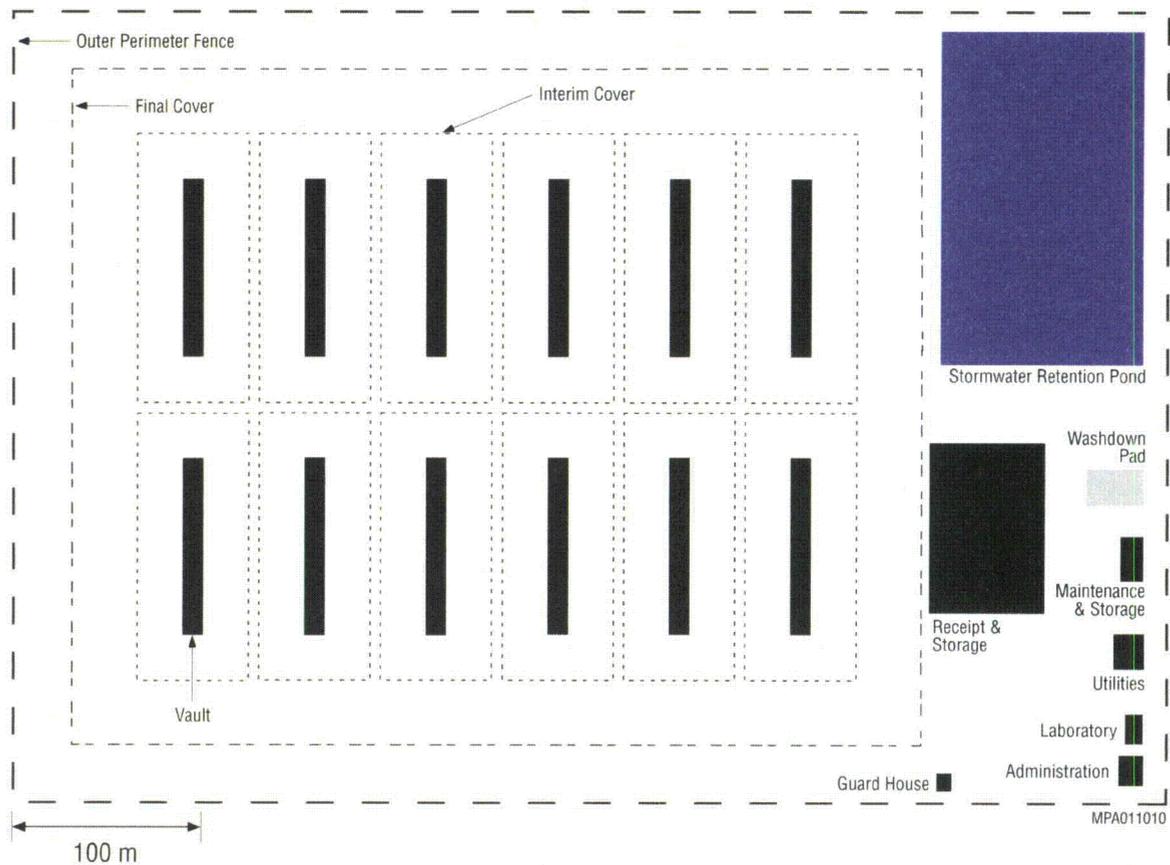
Layout of a Conceptual Vault Disposal Facility
